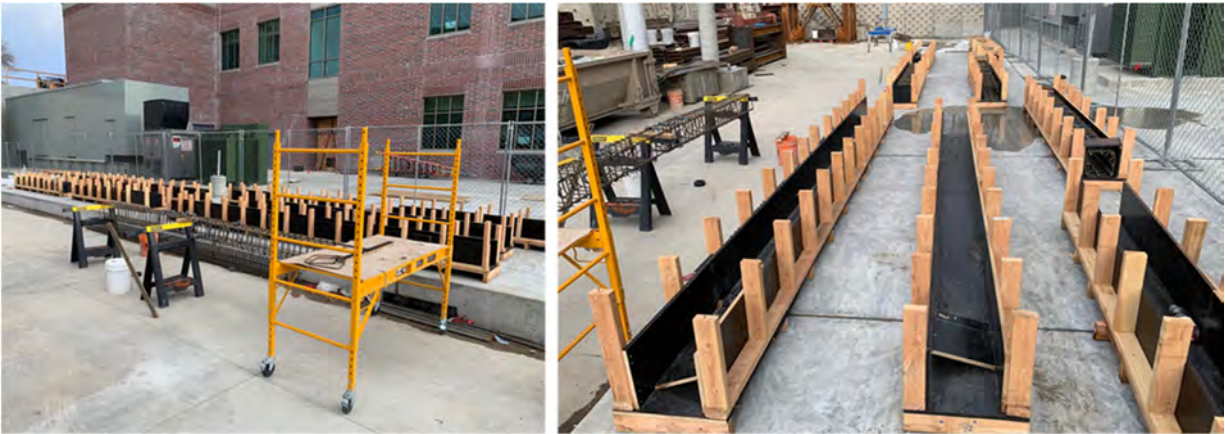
Formwork for nine columns at UNR Structures Laboratory construction yard
